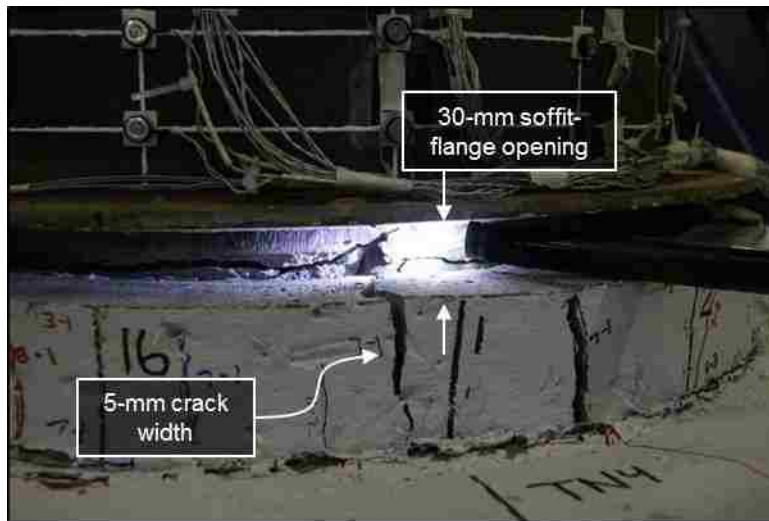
WRC cracking on South face of cap beam at 7.04% drift
